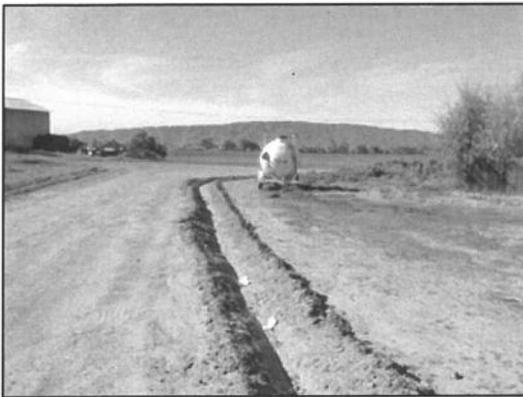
Maintained irrigation ditch along the access road to SCC35.
